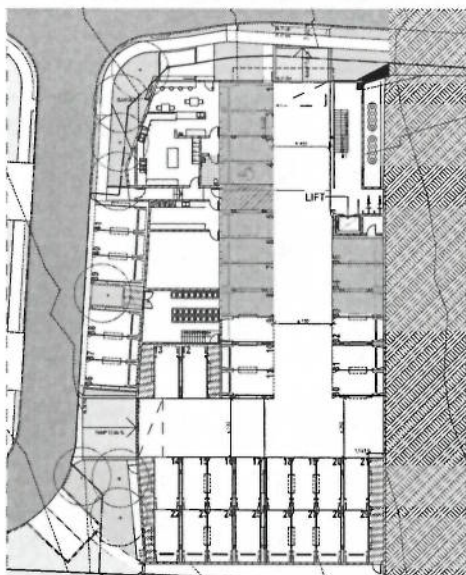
In mixed use buildings, carparking for childcare should be located closest to the lift or to the childcare component of the building.
